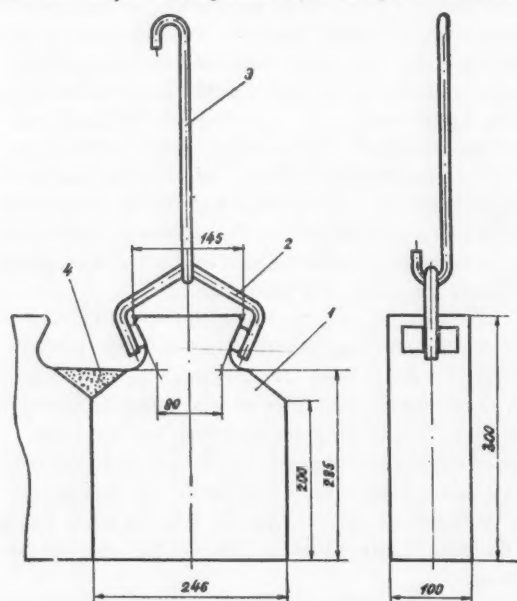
Individual anchorage of roof brick: 1) suspended brick; 2) bracket; 3) suspension hook; 4) thin mortar mixture.
